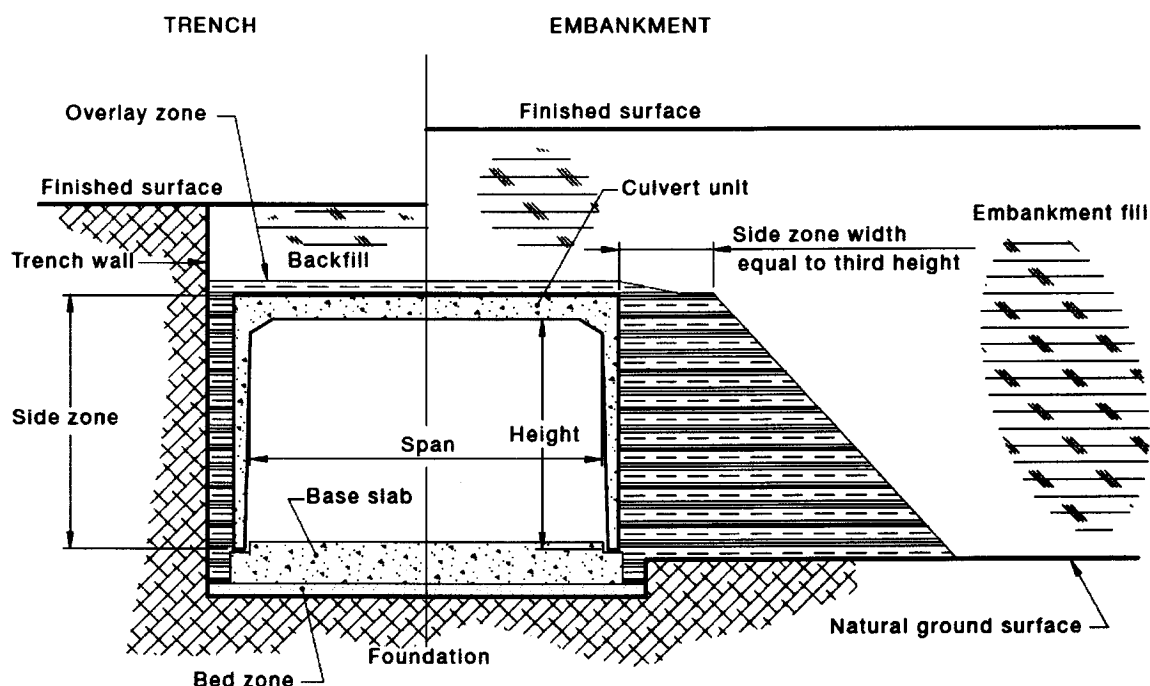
Typical inverted U-shaped box culvert (AS 1597.1-2010)
